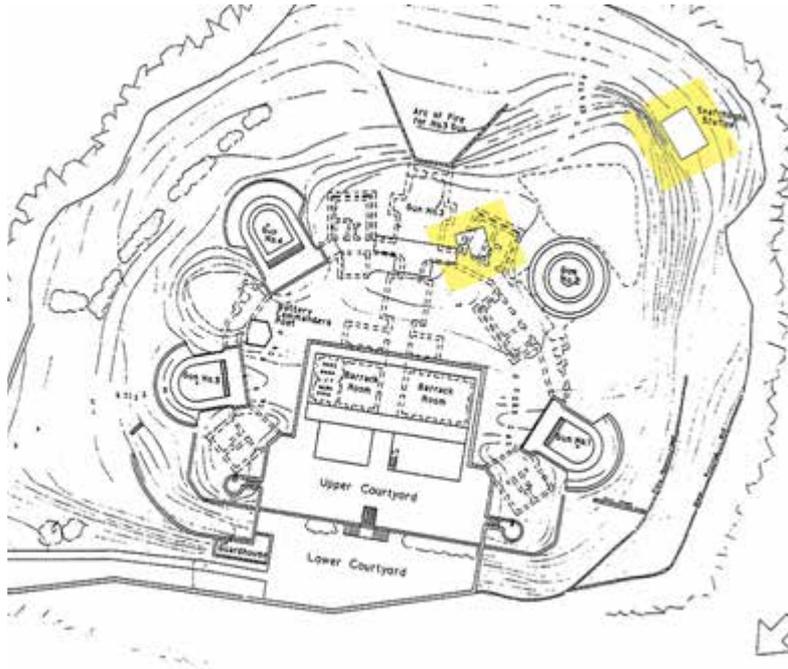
Plan of the island highlighting WWII constructions prior to demolition. The WWII searchlight station is shown in the top right (south of the island), while the pillbox gun mount was located near the casemate opening. (Source: NPWS)
